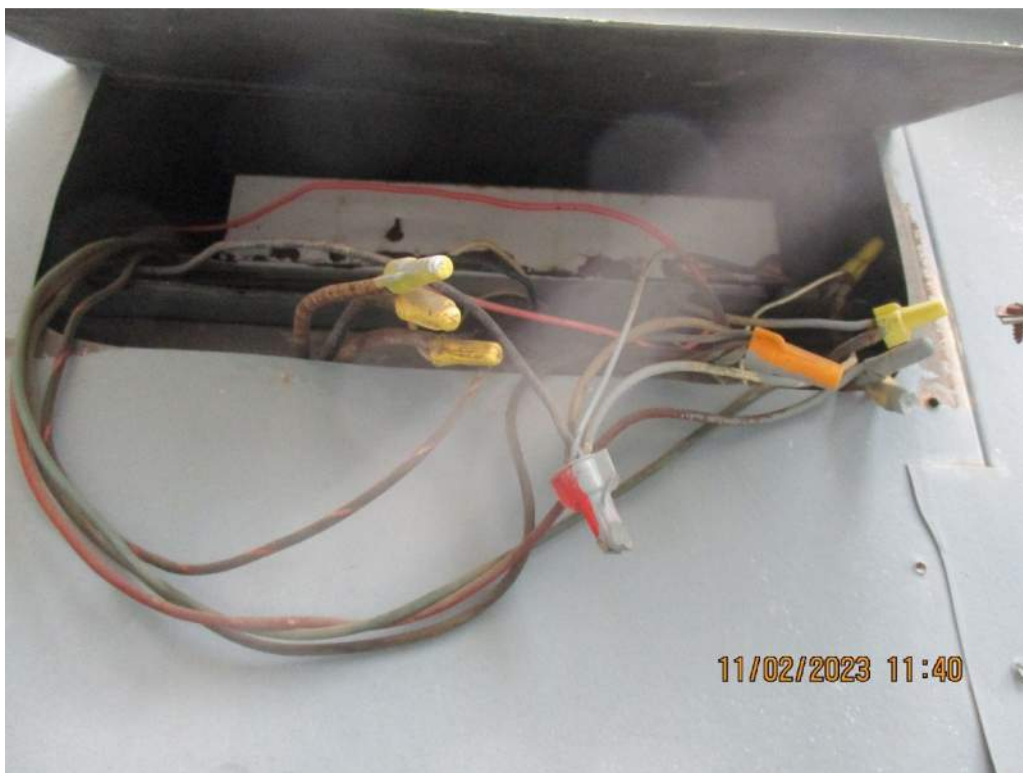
Electrical Wiring Within Interior Paneling Access Locations - Typical
